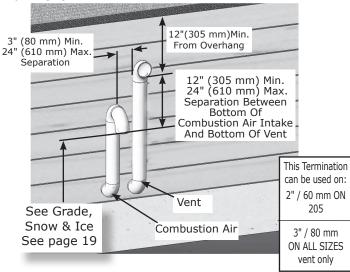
Twin Pipe Side Wall Vent (Multiple Appliances) This Termination This Termination
